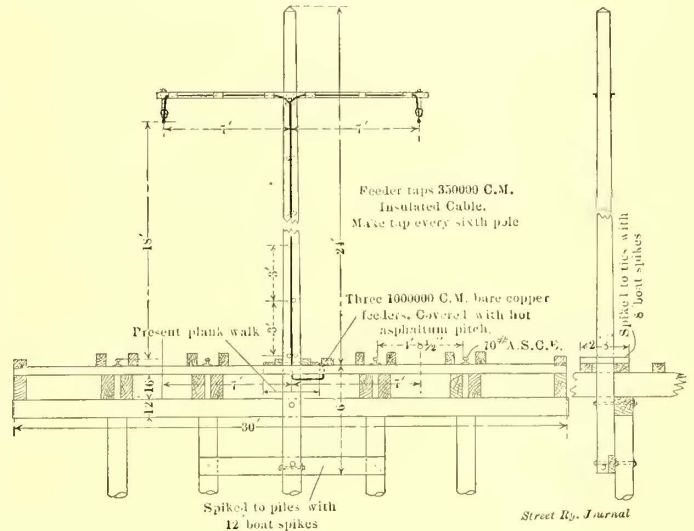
TROLLEY POLE CONSTRUCTION ON EMERYVILLE WHARF
